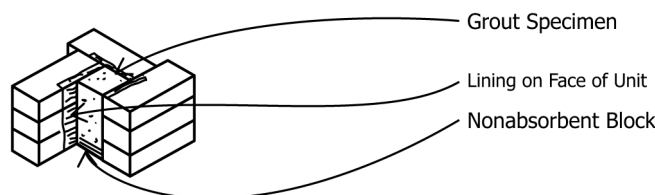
Example of Grout Mold (Units 6 in. (152.4 mm) or Less in Height, 2 1/4 in. (57.2 mm) High Brick Shown)
